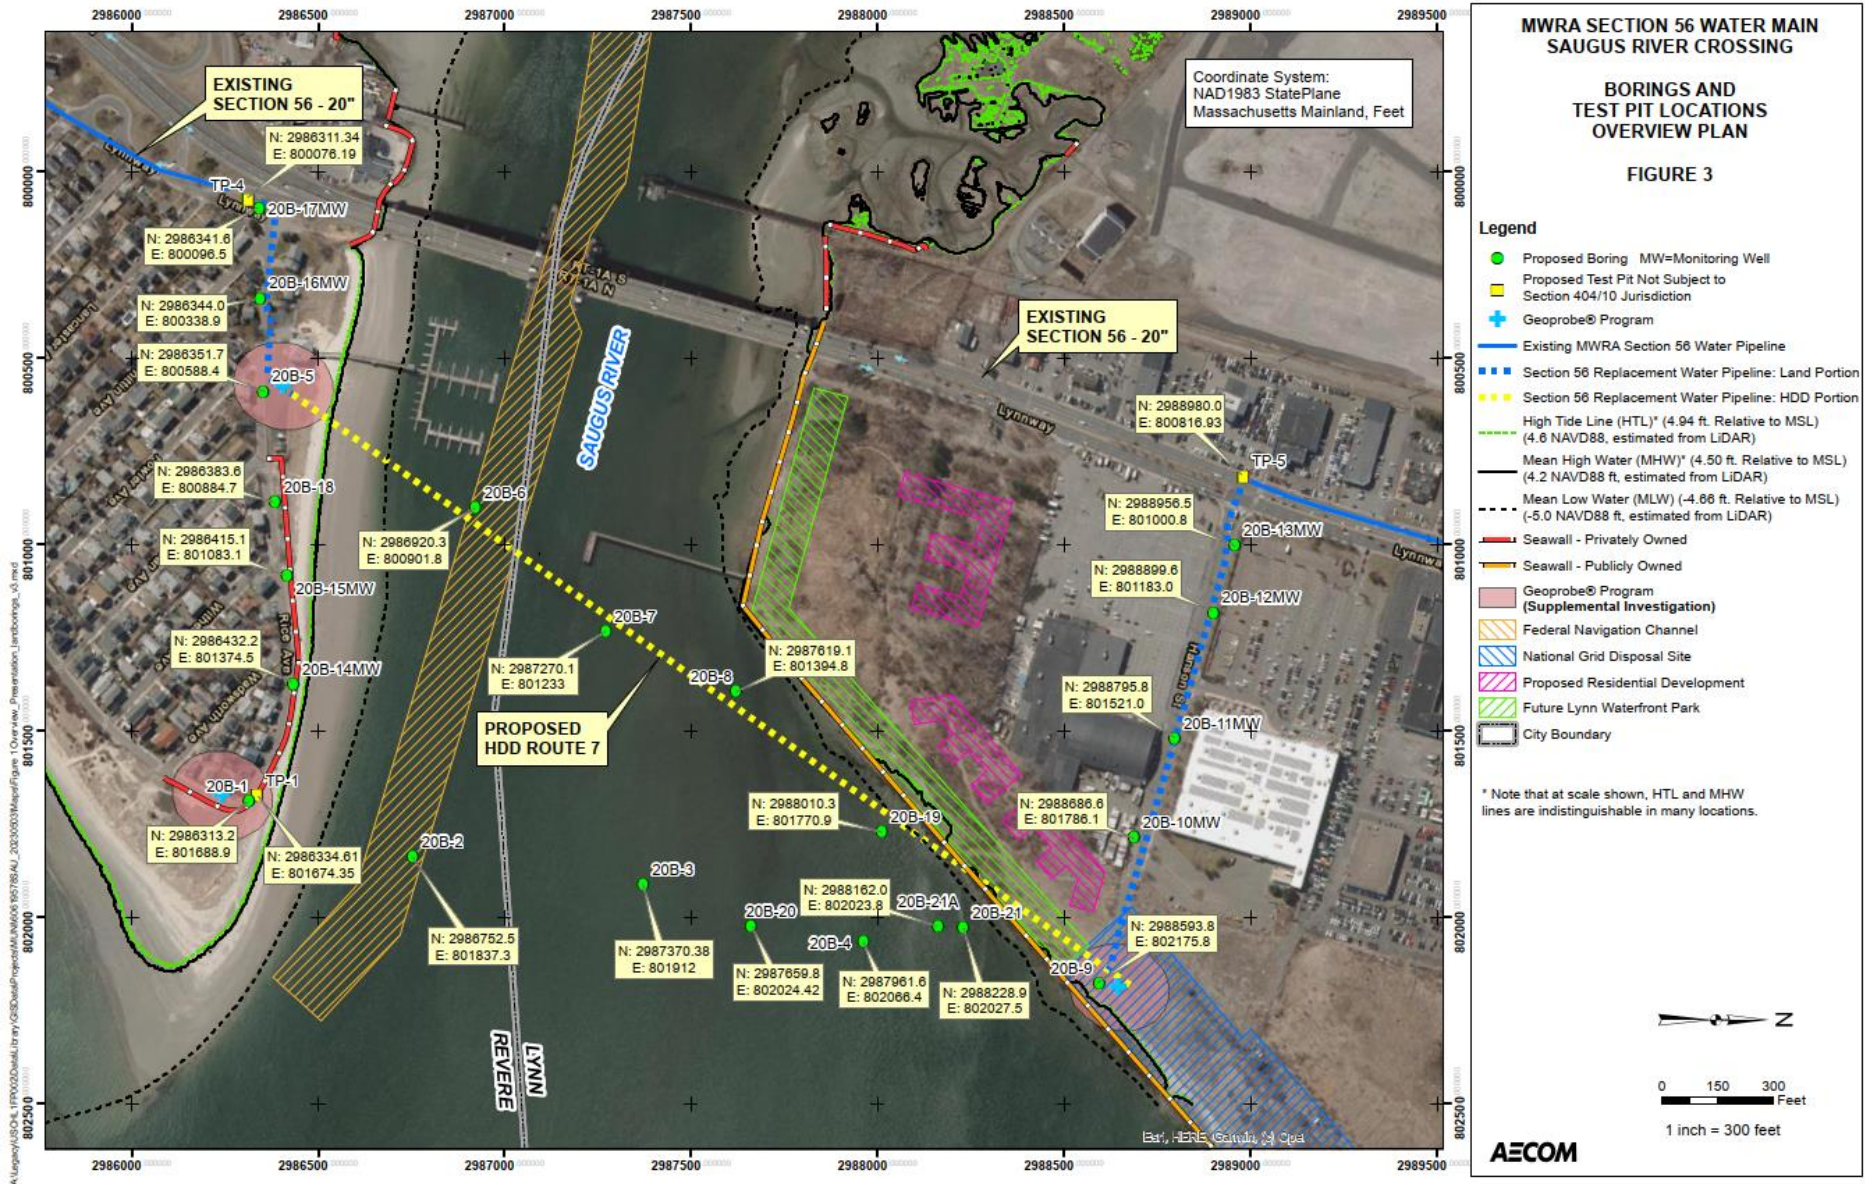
Geotechnical Borings and Test Pit Locations Overview Plan.
